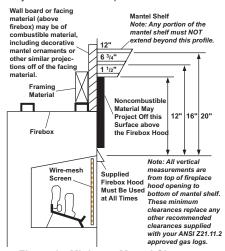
Minimum Mantel Clearances for Built-In Installation
